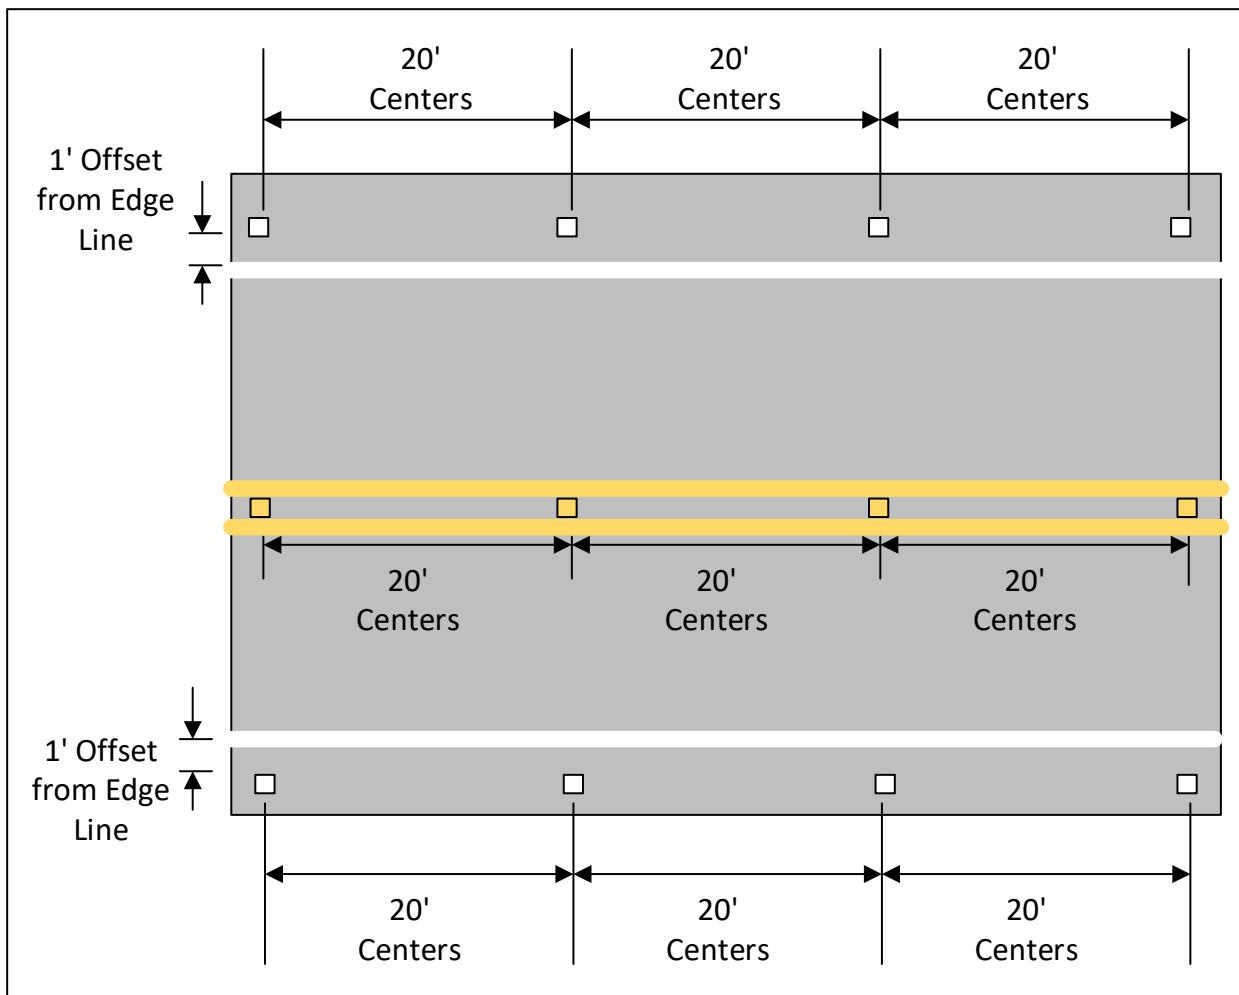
Proposed Enhanced Pavement Markings for FM 244.
